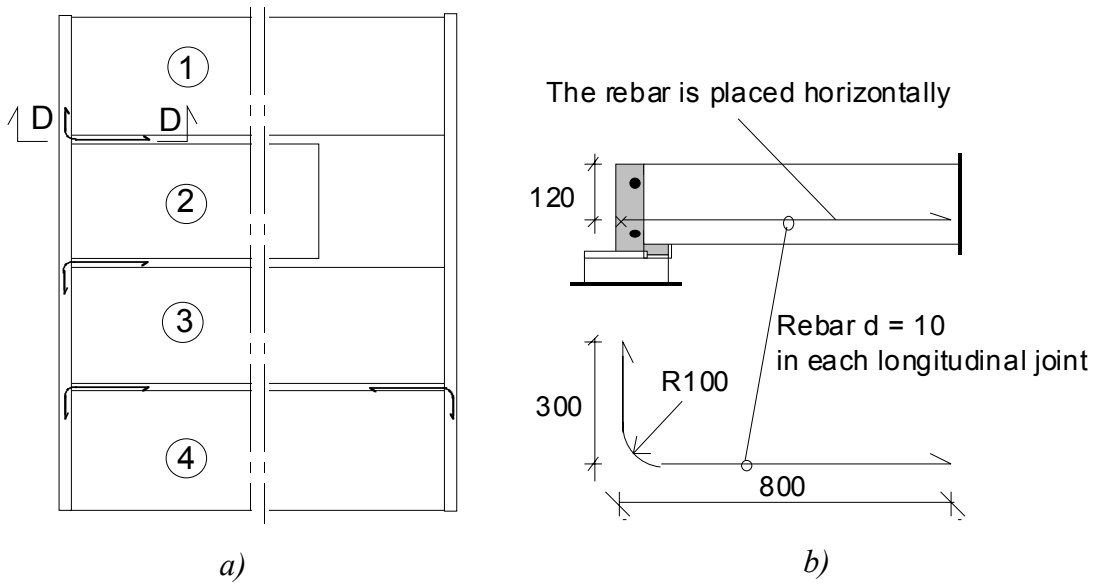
Tie reinforcement in longitudinal joints of floor. a) Plan. b) Section D-D.
